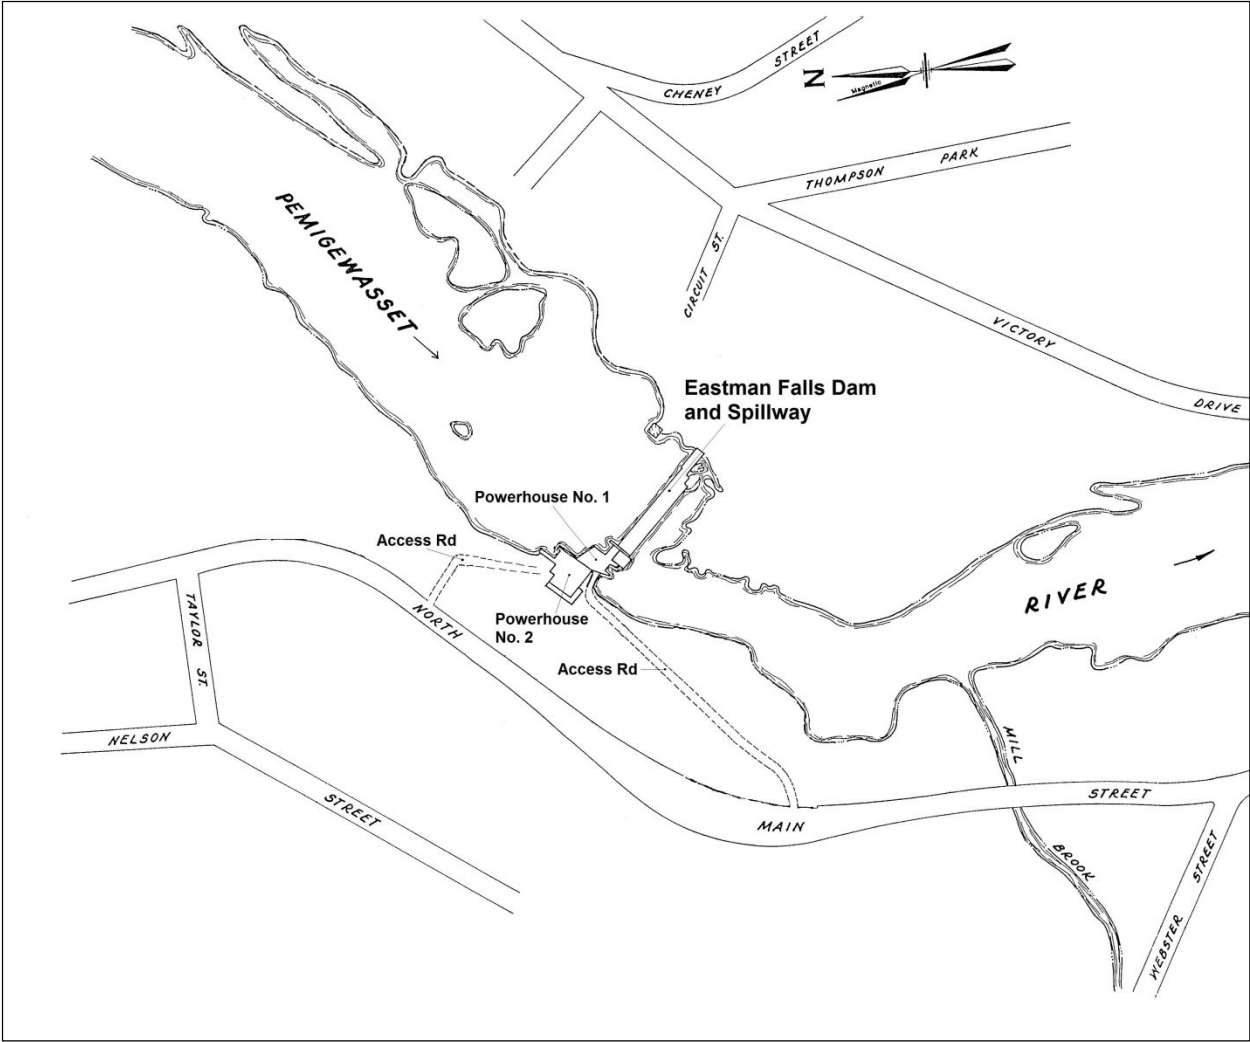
Existing Eastman Falls Project site plan. Source: the applicant, as modified by staff.
